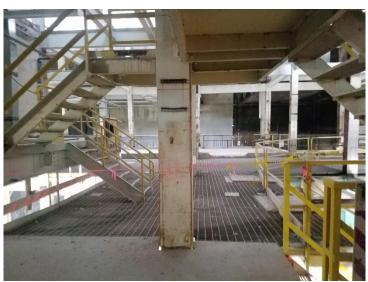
Metal grating floors, 3rd Floor between Column Lines B&C, looking east
